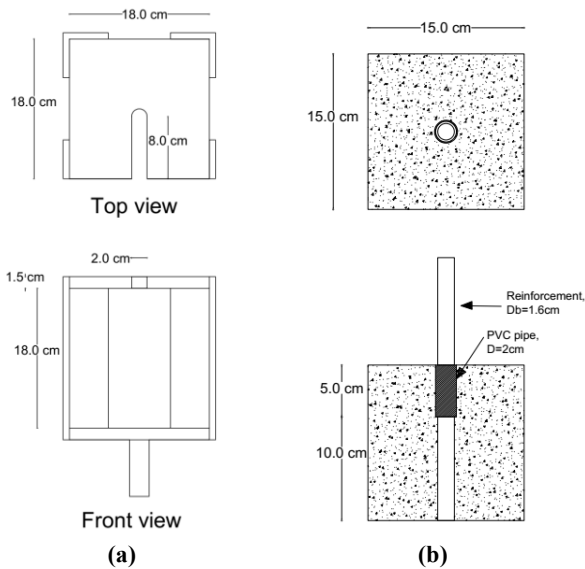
(a) steel box for pull out test, (b) concrete specimen for pull out test.
